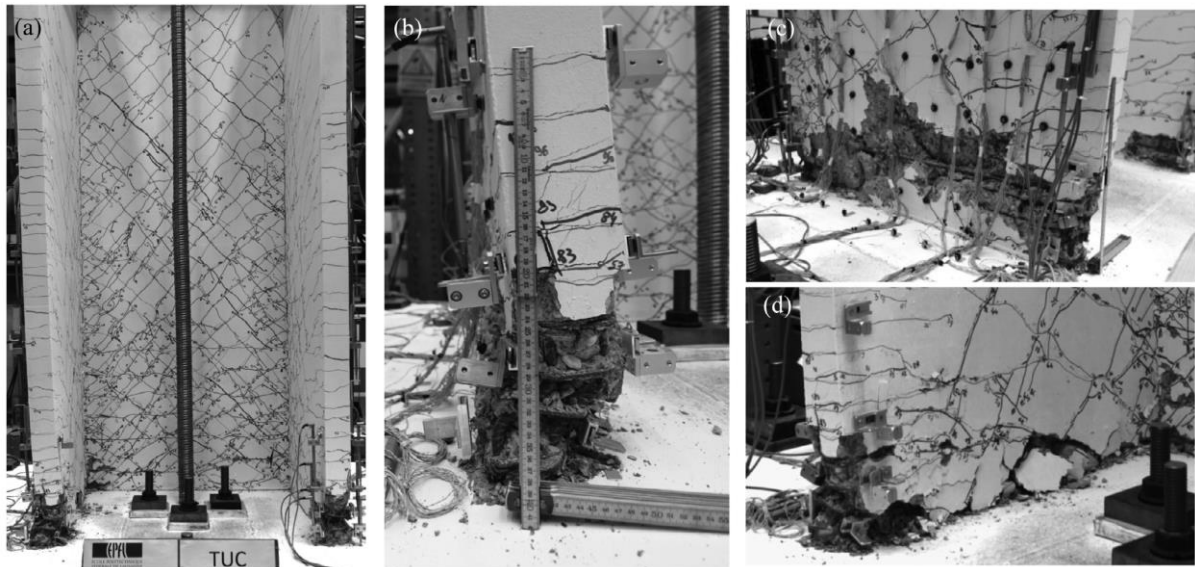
Out-of-plane buckling and compression failure of the concentrated reinforcement layout flange of specimen TUC at 1% drift (Constantin and Beyer 2016)
